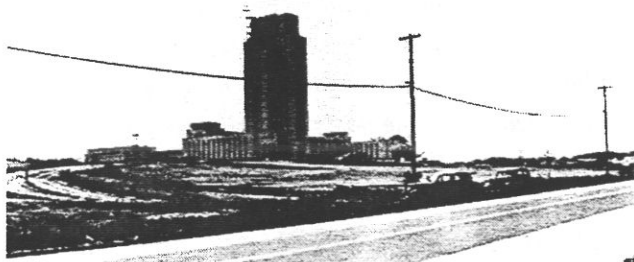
View of tower (under construction) from Rockville Pike, looking southeast, 1941.
